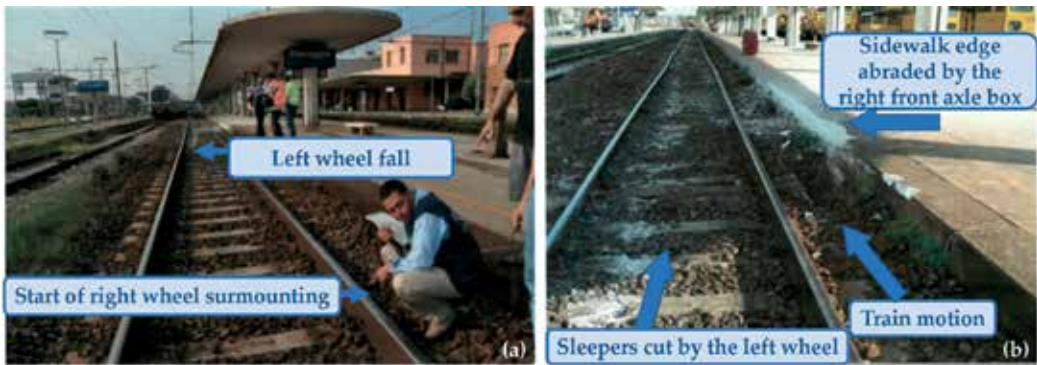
Traces of the initial phase of the derailment. (a) Start of the surmounting of the rail by the right front wheel of the first bogie of carriage no. 1. (b) Sleepers cut by the left wheel and sidewalk edge abraded by the right front axle box of the first bogie of carriage no. 1.
